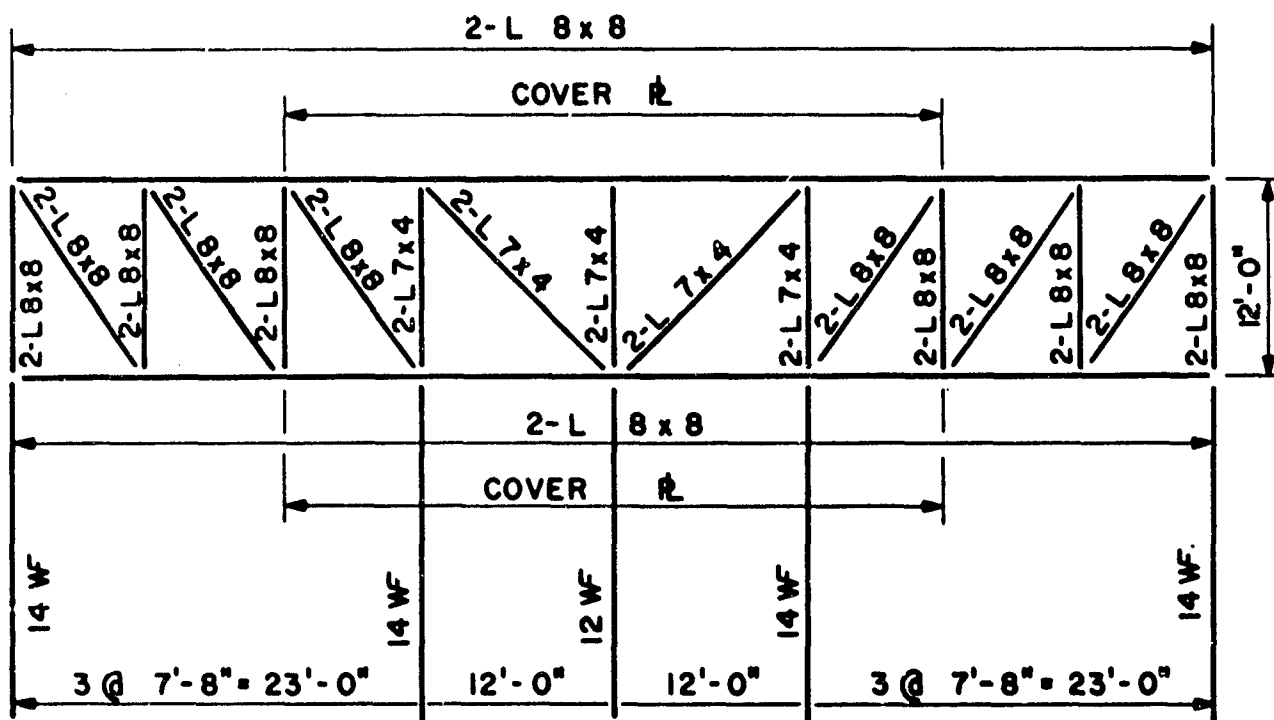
SECTION A-A ELEVATION OF TRUSS
